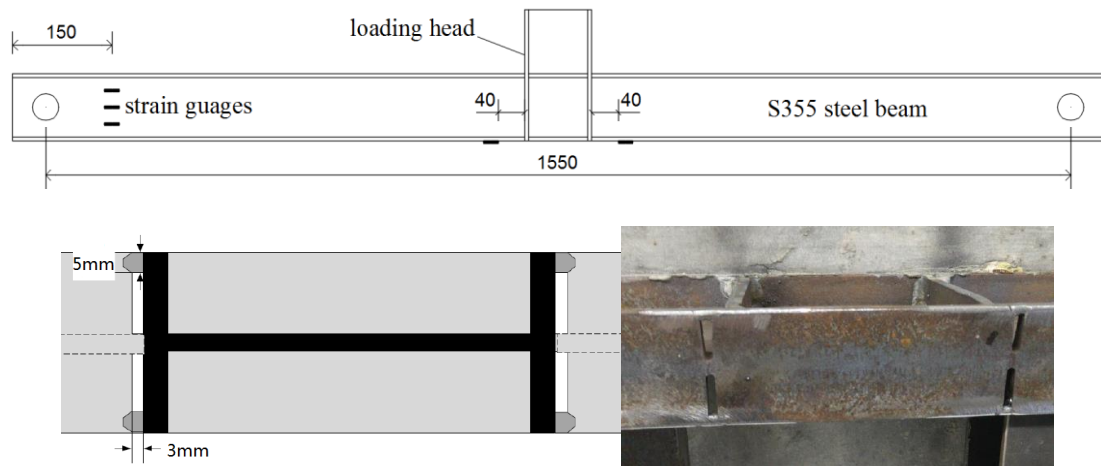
Steel double beam specimen B1, with notch cuttings spot welds
